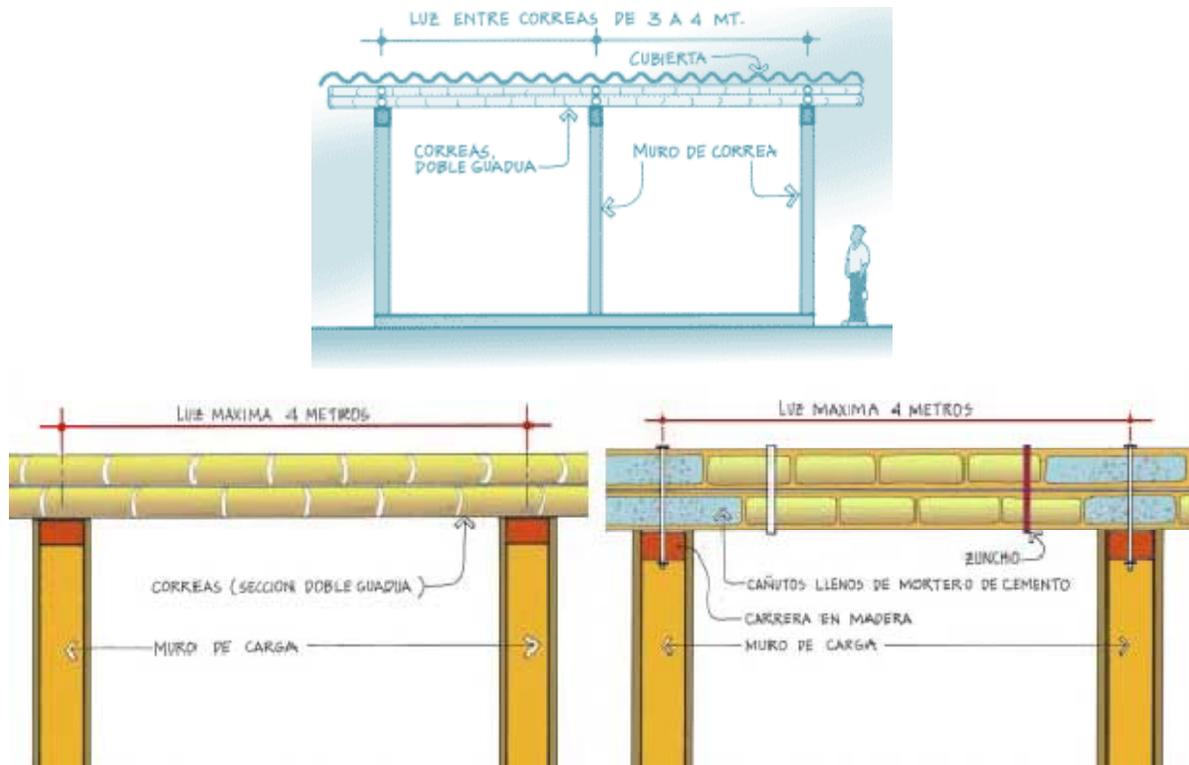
Recommended beam spans and connections in typical Guadua roof construction (AIS,2001).
